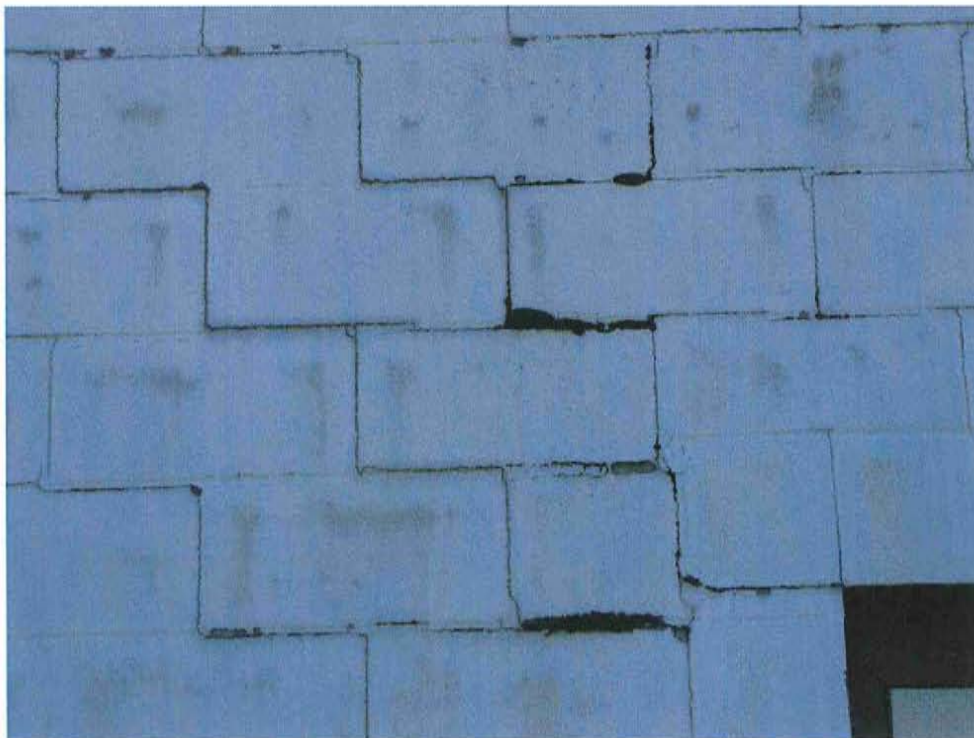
Control Building - Close up of the cracked masonry block mortar joints in photo 57, some with moss growing out of the joints.
